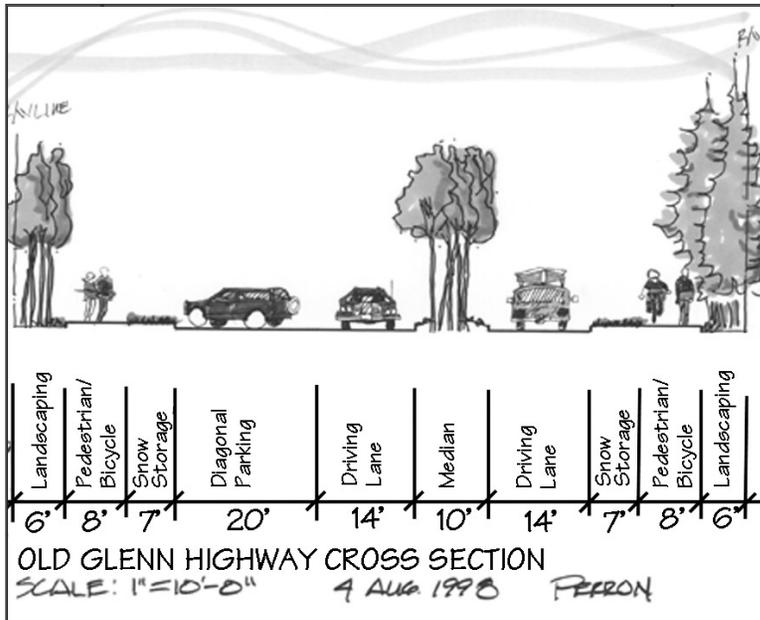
Old Glenn Highway cross-section as proposed by the Perron Collaborative
